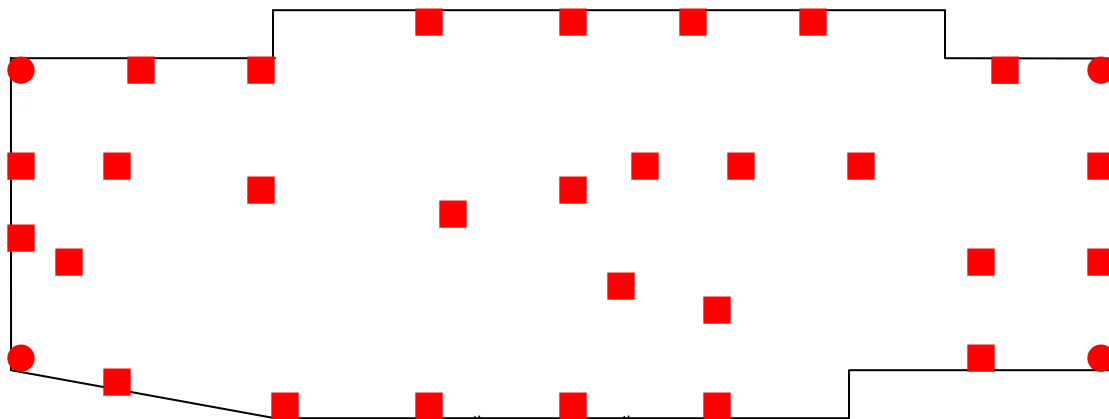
Floor plan layout of the 11th through 38th floors, which is most the common plan
